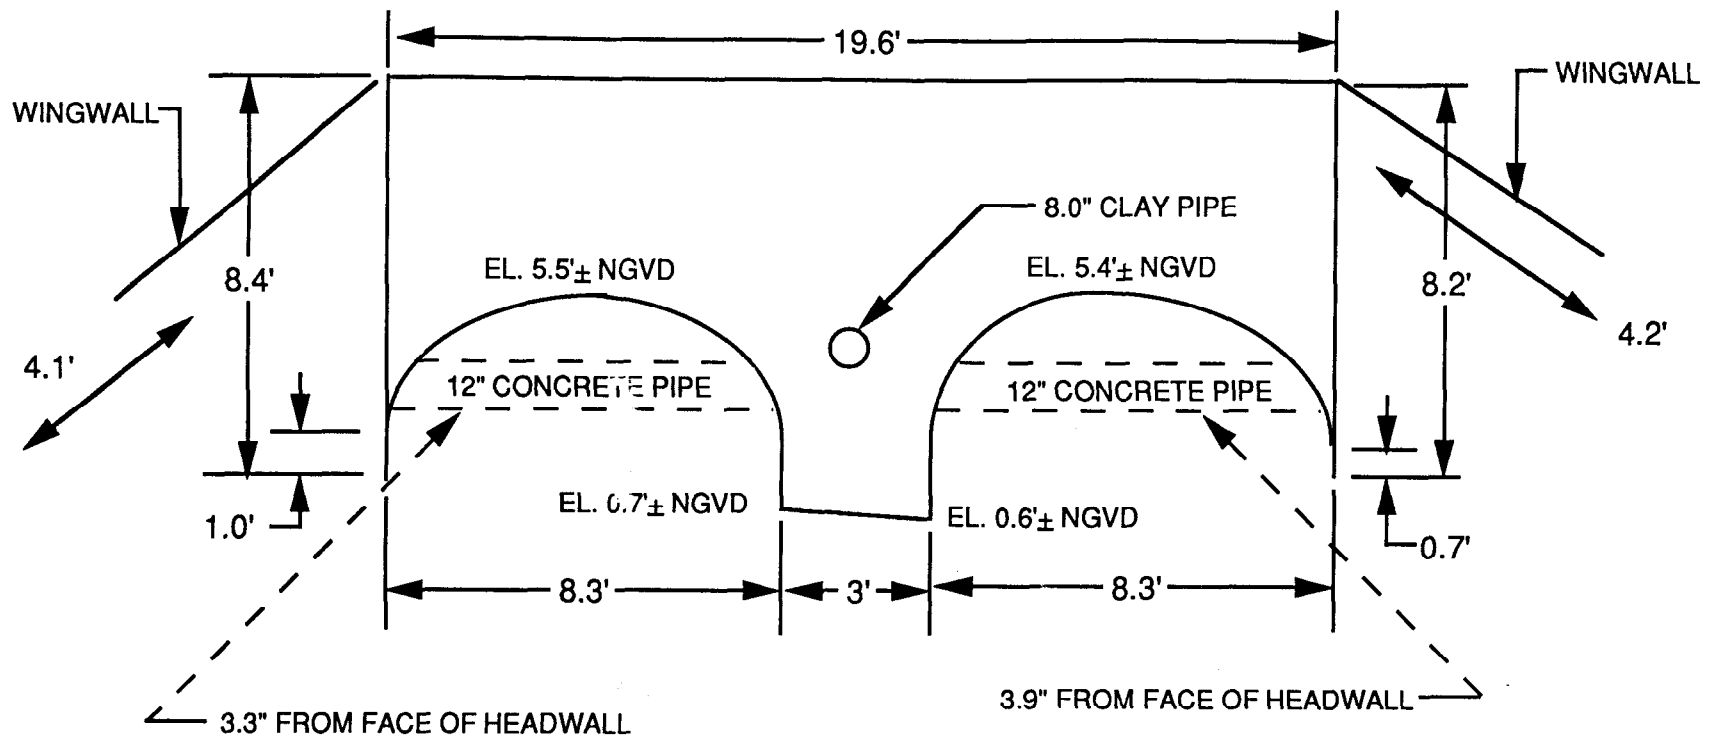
B: Dike Road Tidegate Structure, View Looking Downstream from Marsh side. Note: Sluice board bays
